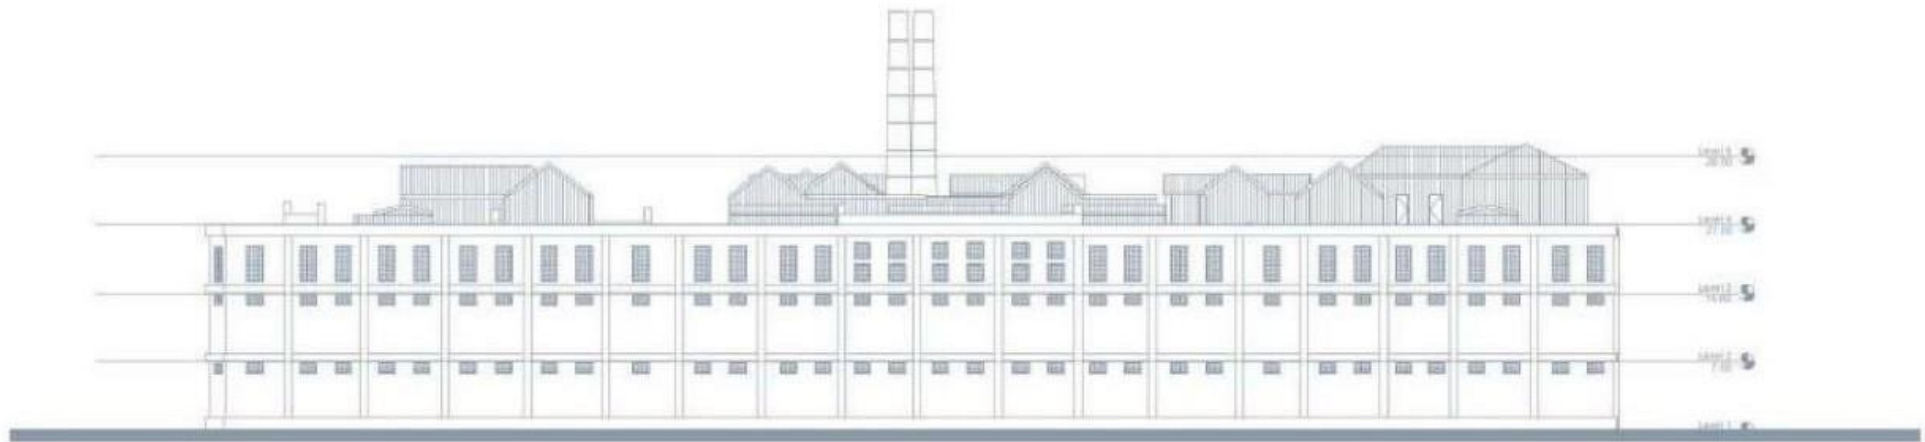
Makbas El-Nile South Elevation. Scale 1:800. (Elaborated by author)
